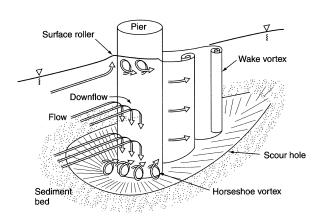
Bridge pier scour in New Zealand (Melville and Coleman, 2000).
